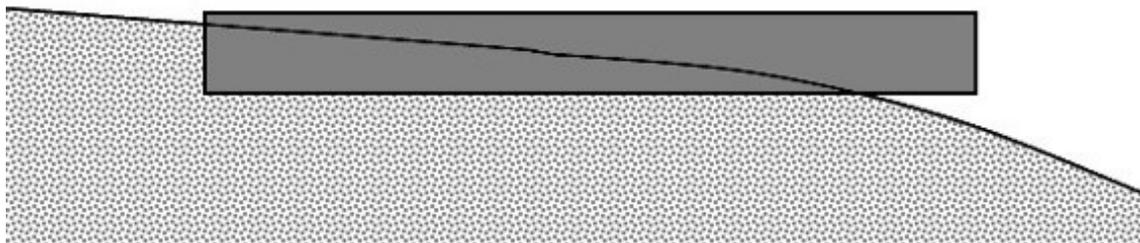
Example of Slope of My 8 x 10 foot raised bed.
